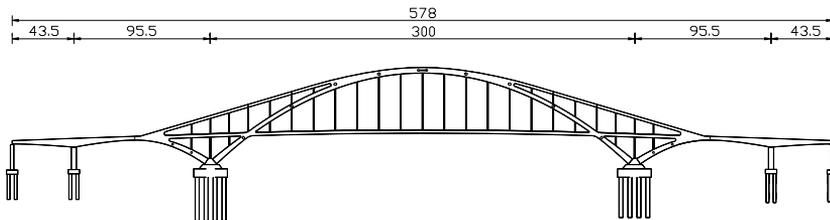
Elevation drawing of Dongping bridge (unit:m)
